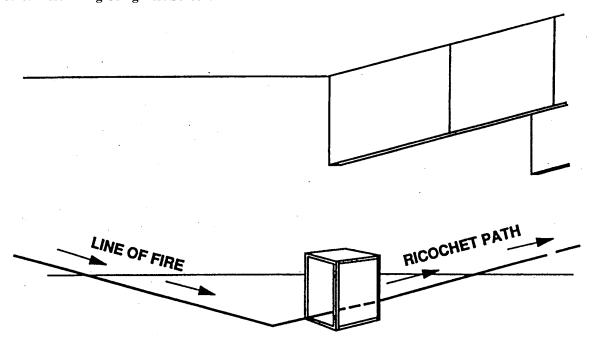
M60 Machine Gun, 10 Meter, 5-Position, Tube Range.
